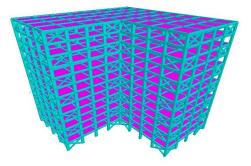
(c) – 3D view of Model 6 (X-Bracing alternative pattern at the corner)
